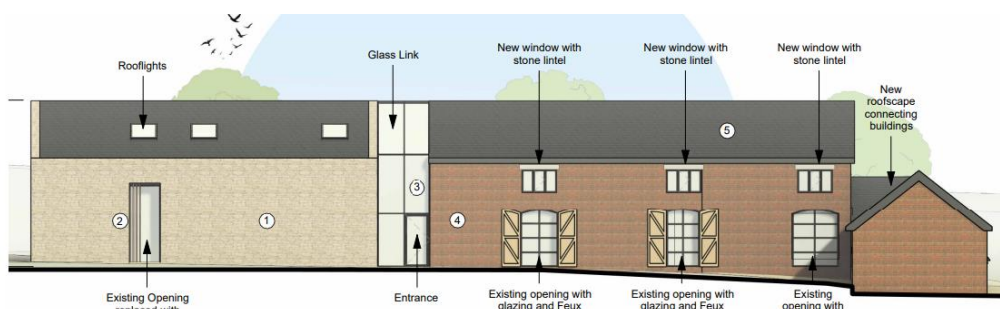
Plot 1 Proposed Front (S) Elevation
